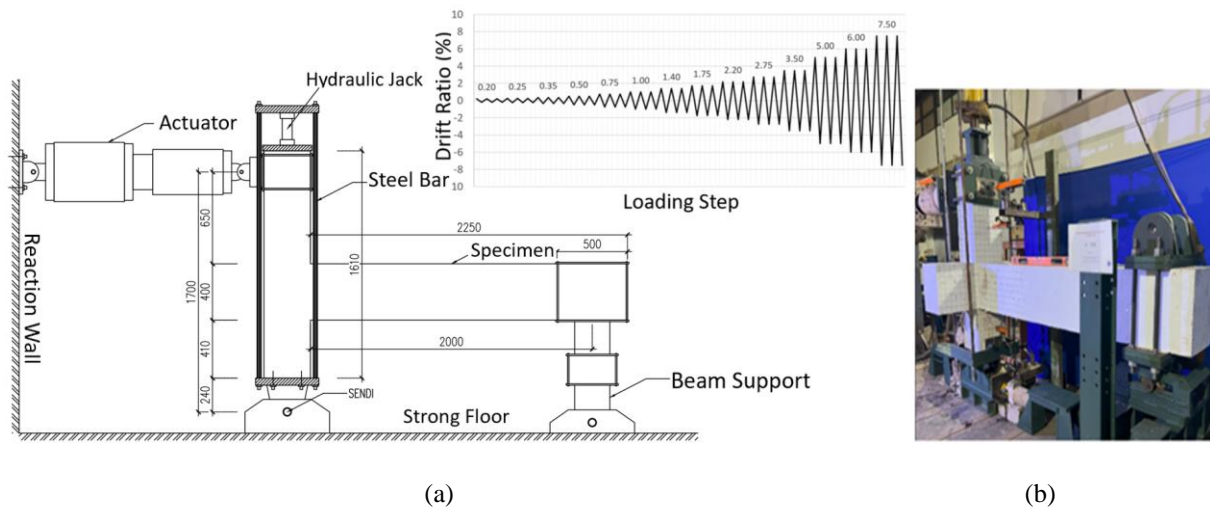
Experimental Setup (a) loading Arrangement and (b) test rig. (Note: all dimensions in millimeters).
